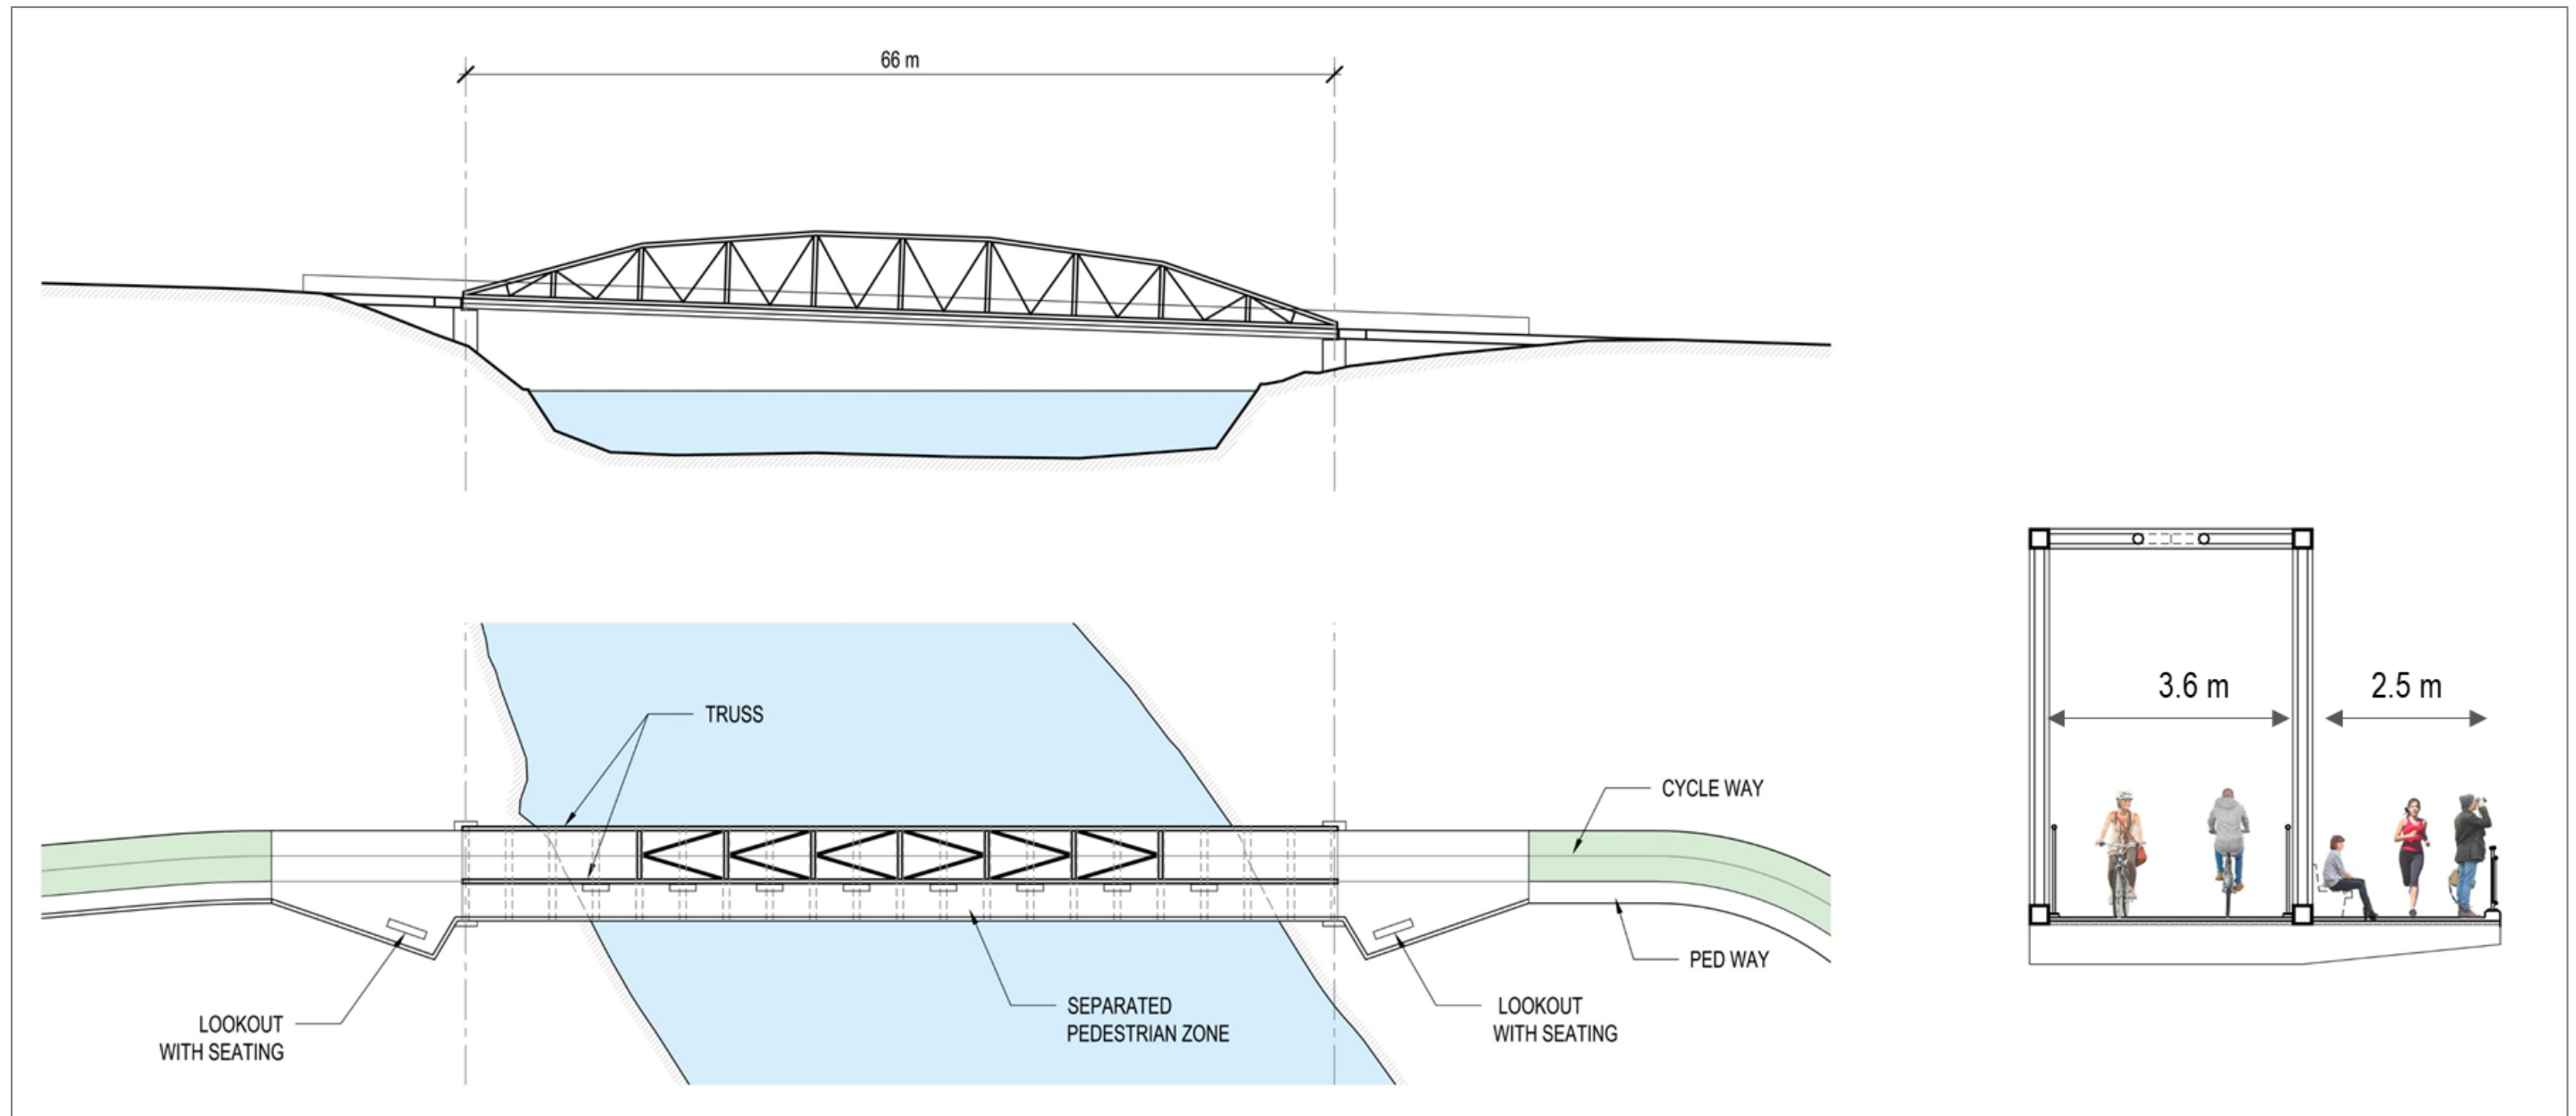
Conceptual Renderings of Bowstring Truss Bridge
